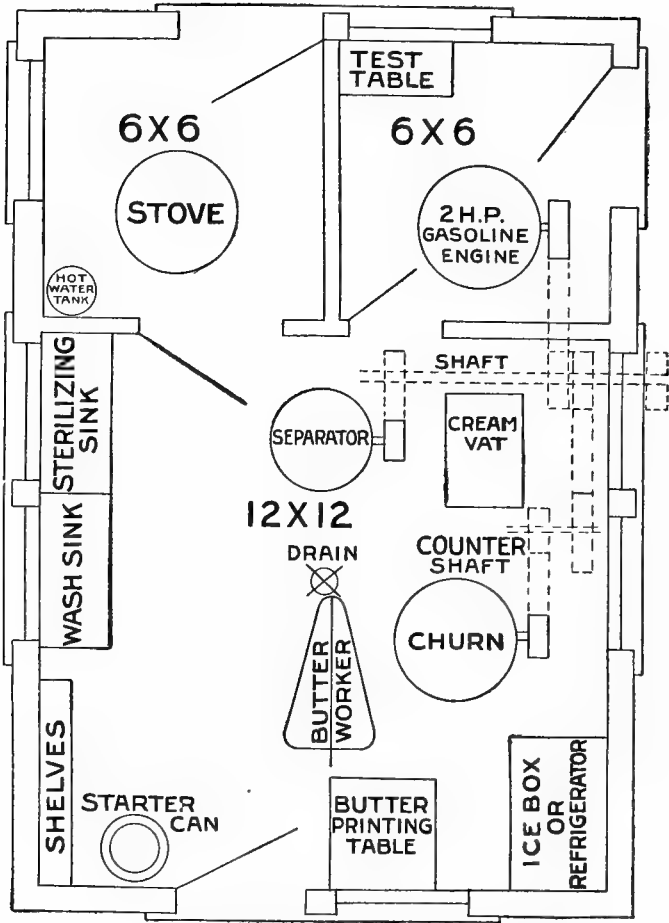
Floor Plan of Dairy House for Farm Buttermaking.
